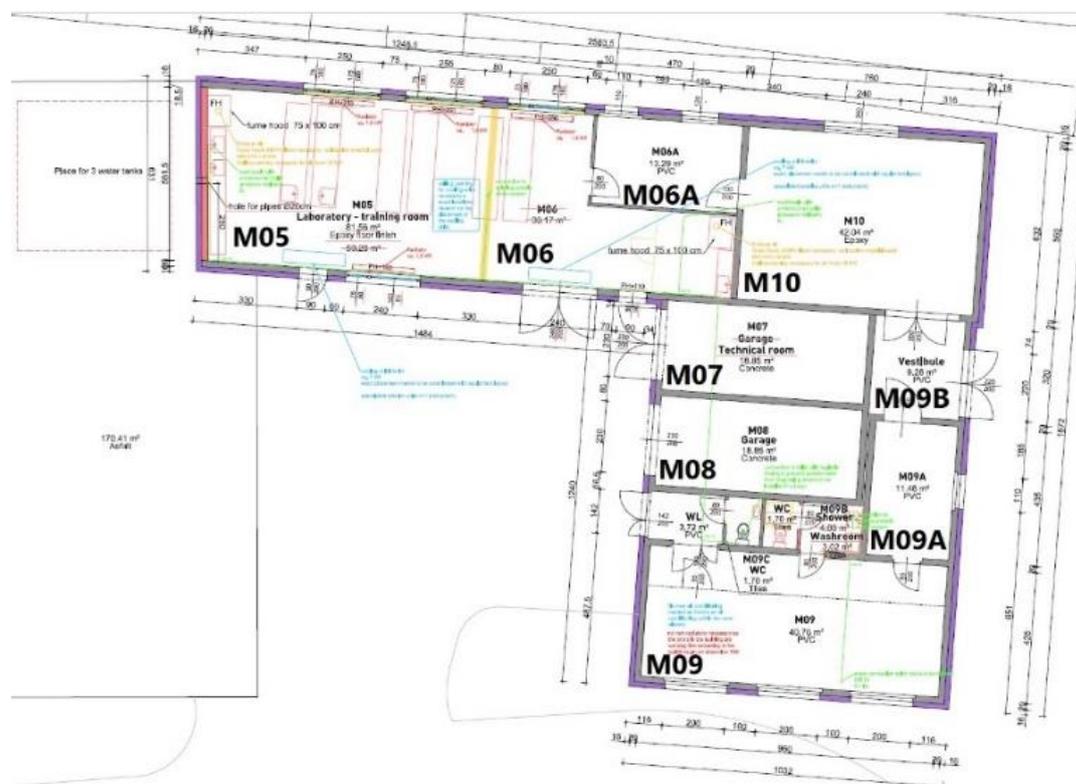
Floor plan refurbishment of M building for the NSF and ancillary experiments/applications, with a total surface of 250 m².
